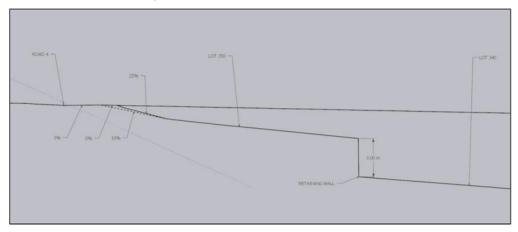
typical cross-section between lots prepared by Council staff showing height of retaining walls between lots and site grades
